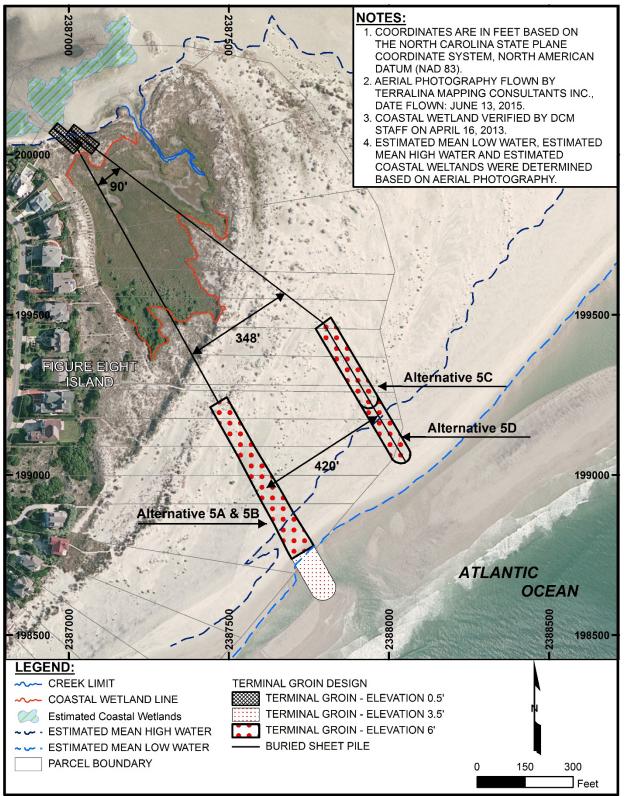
Terminal groin layout for all four (4) terminal groin alternatives on the north end of the island.
